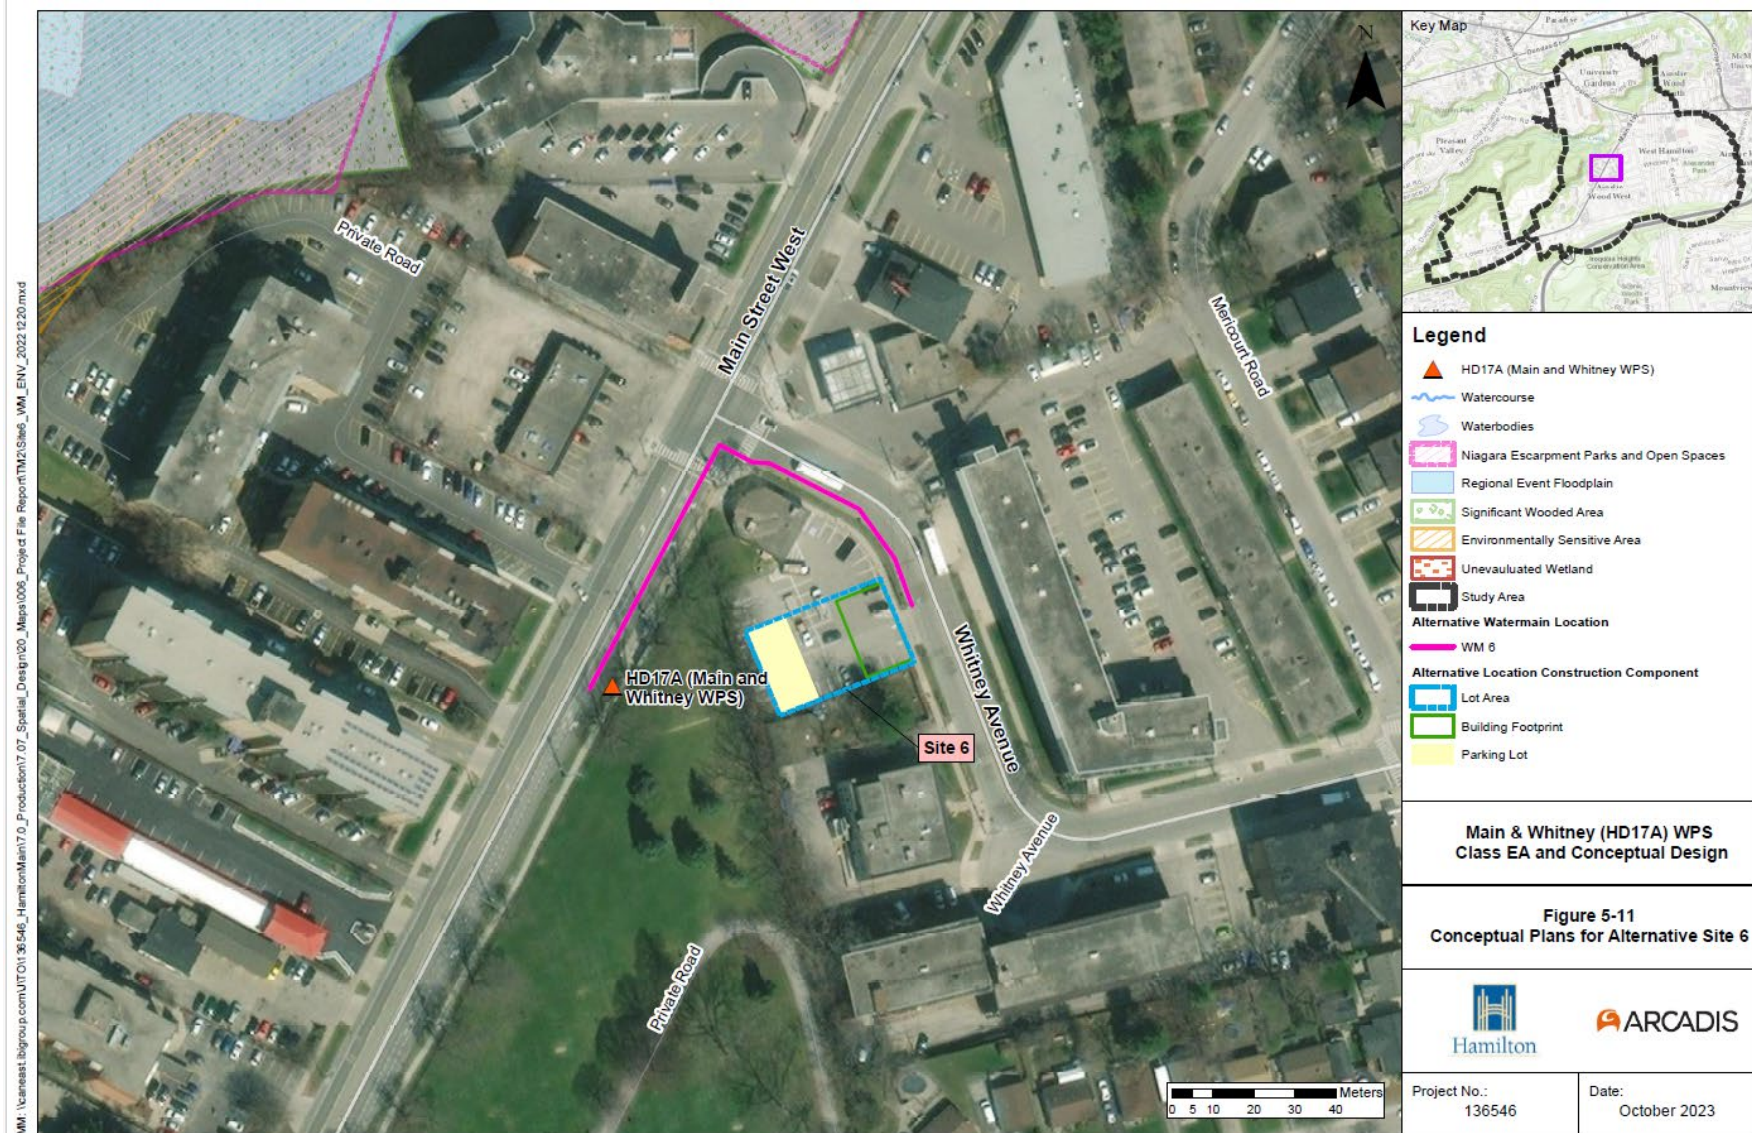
Conceptual Plan for Preferred Alternative Site 6
